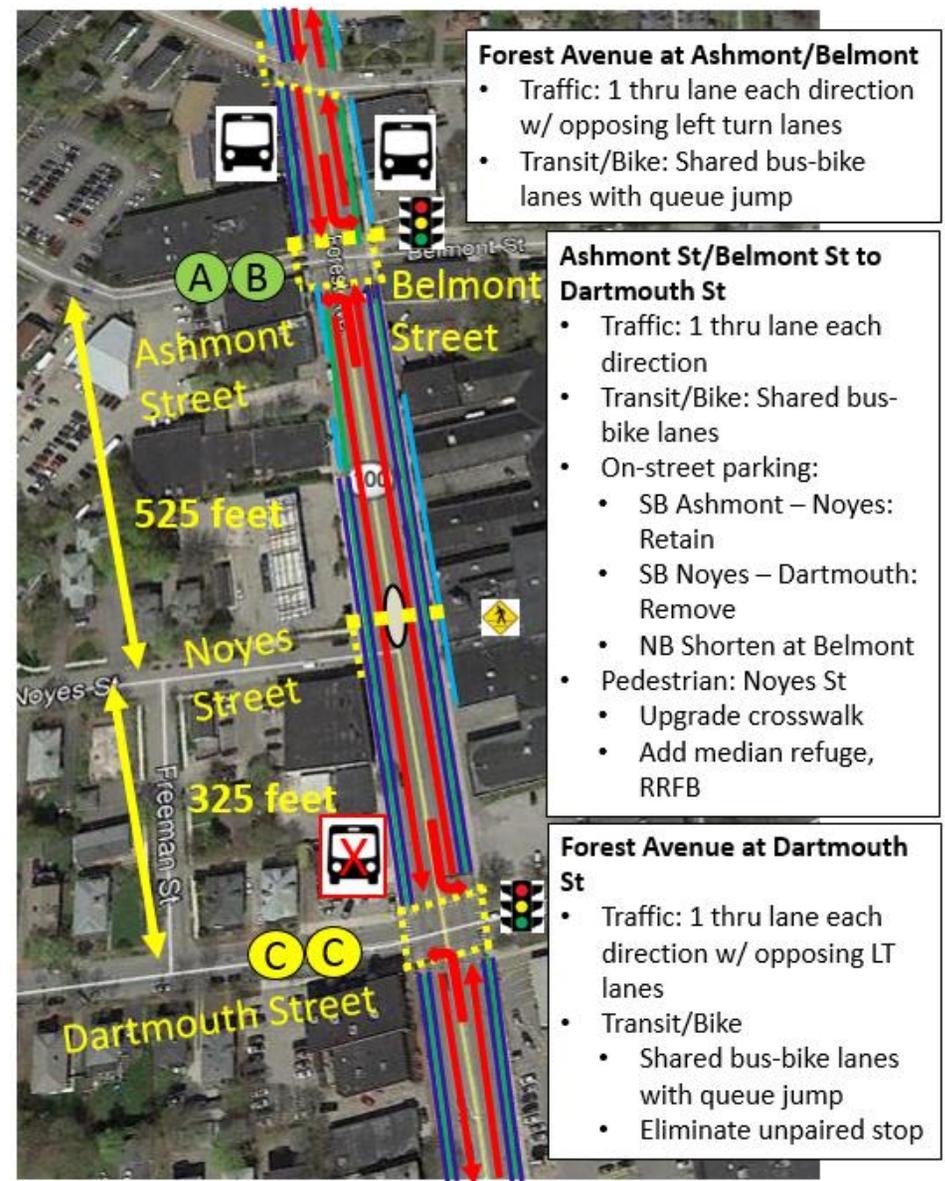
Ashmont Street/Belmont Street to Dartmouth Street – Alternative 2
